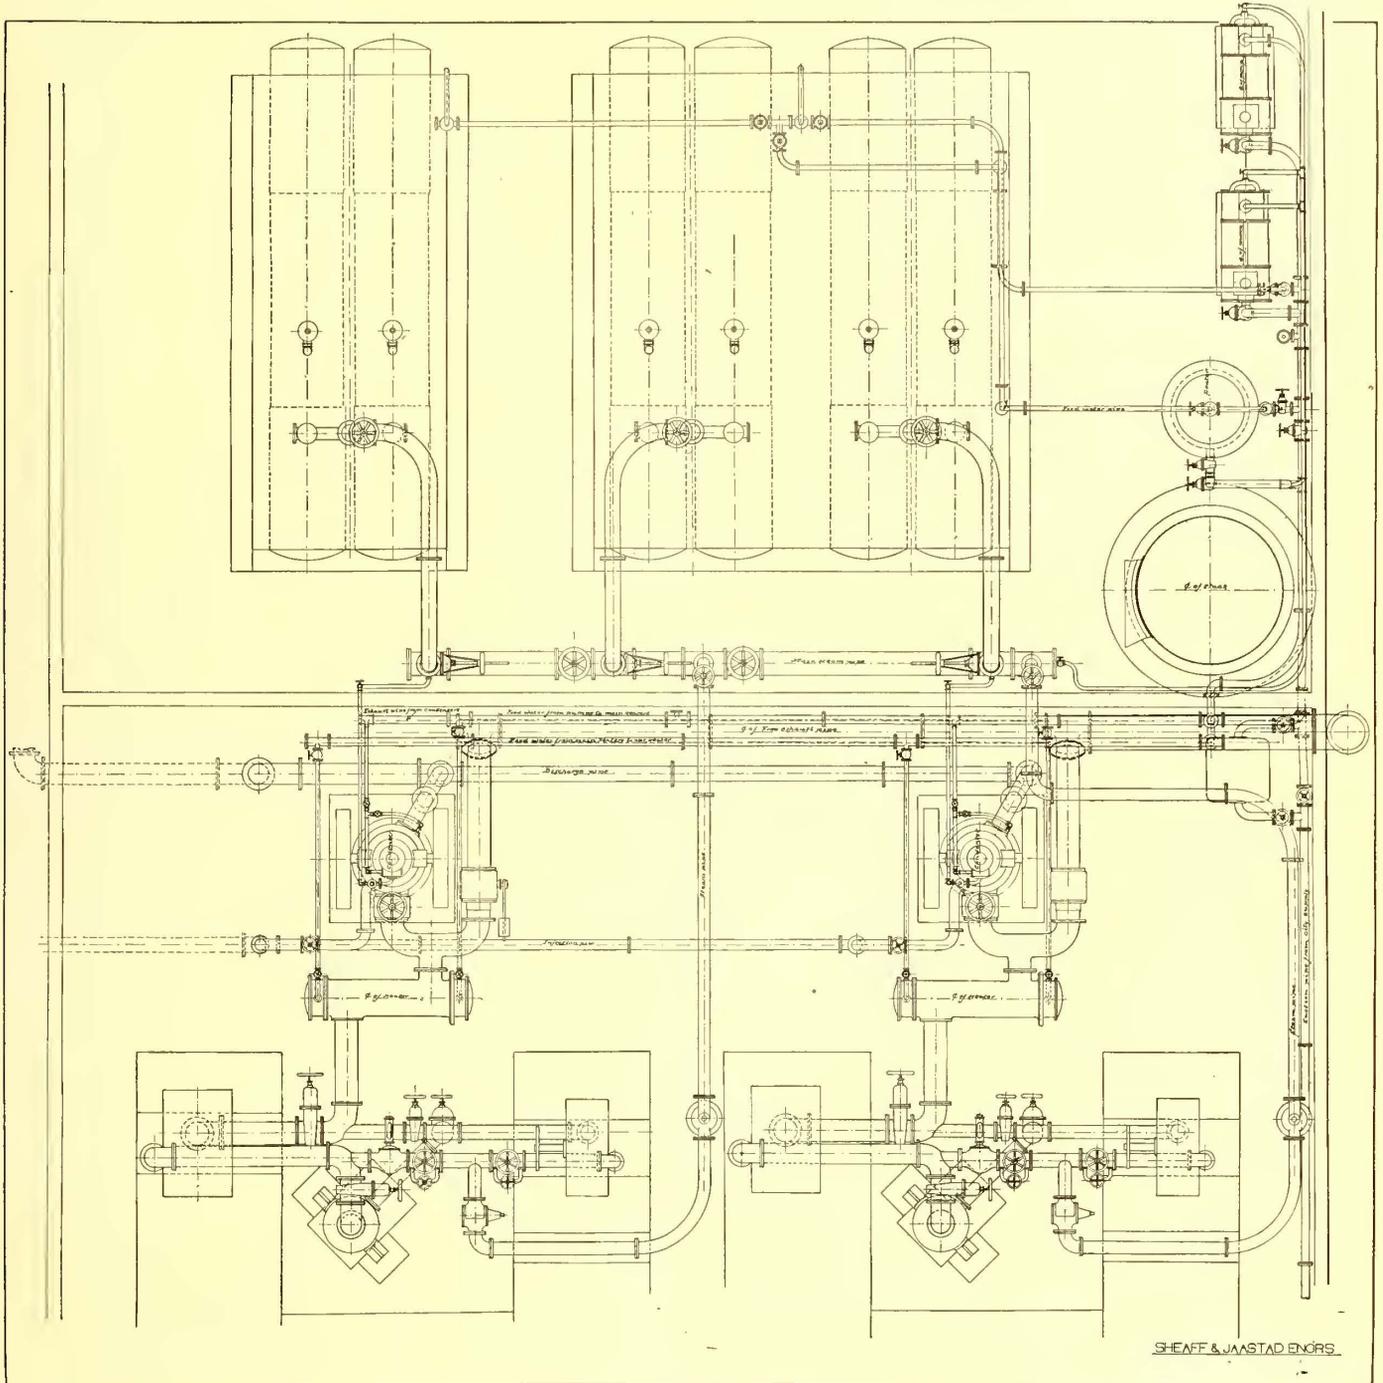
PLAN OF STATION, SHOWING PIPING.
